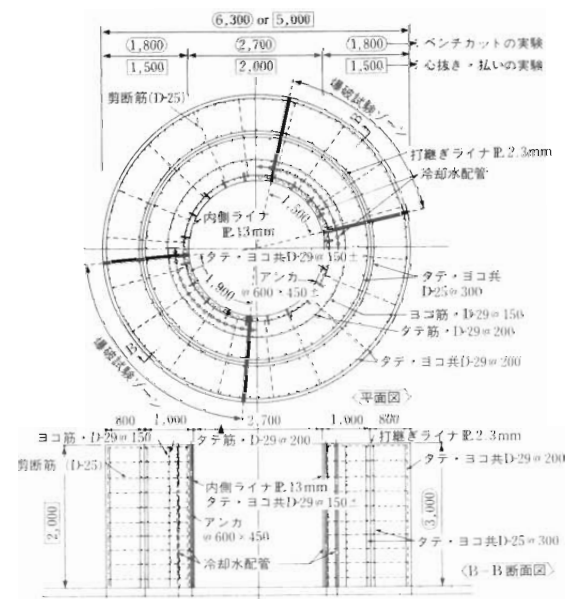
Proportion of Specimen and Reinforcement Arrangement
